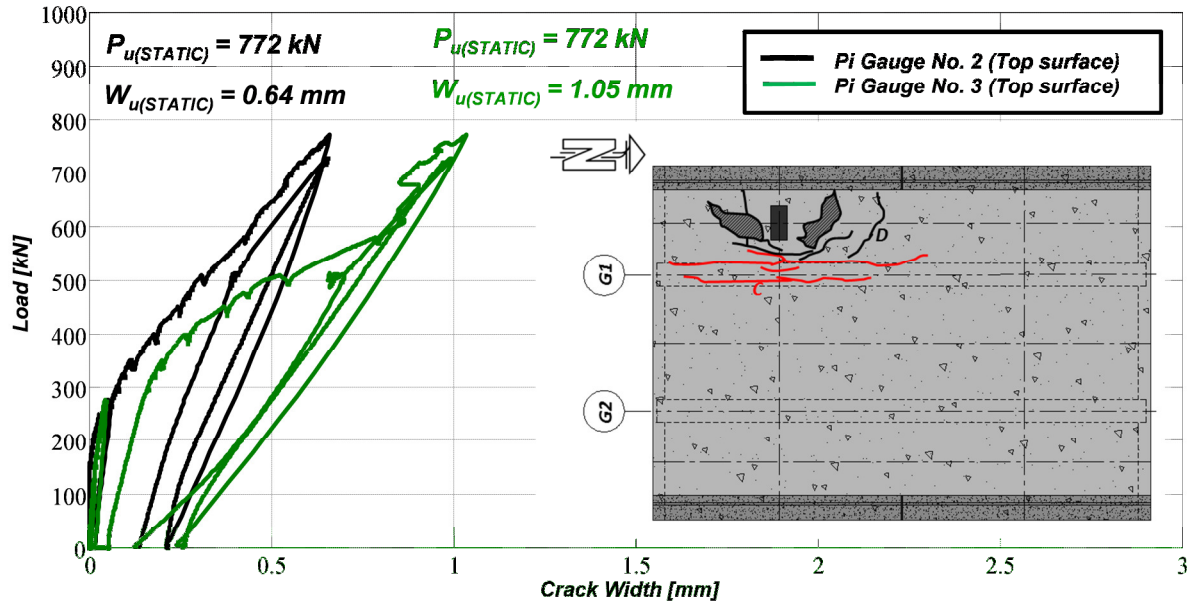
Plot of load versus underside transverse crack width for the cantilever section with steel reinforcement subjected to static monotonic loading
